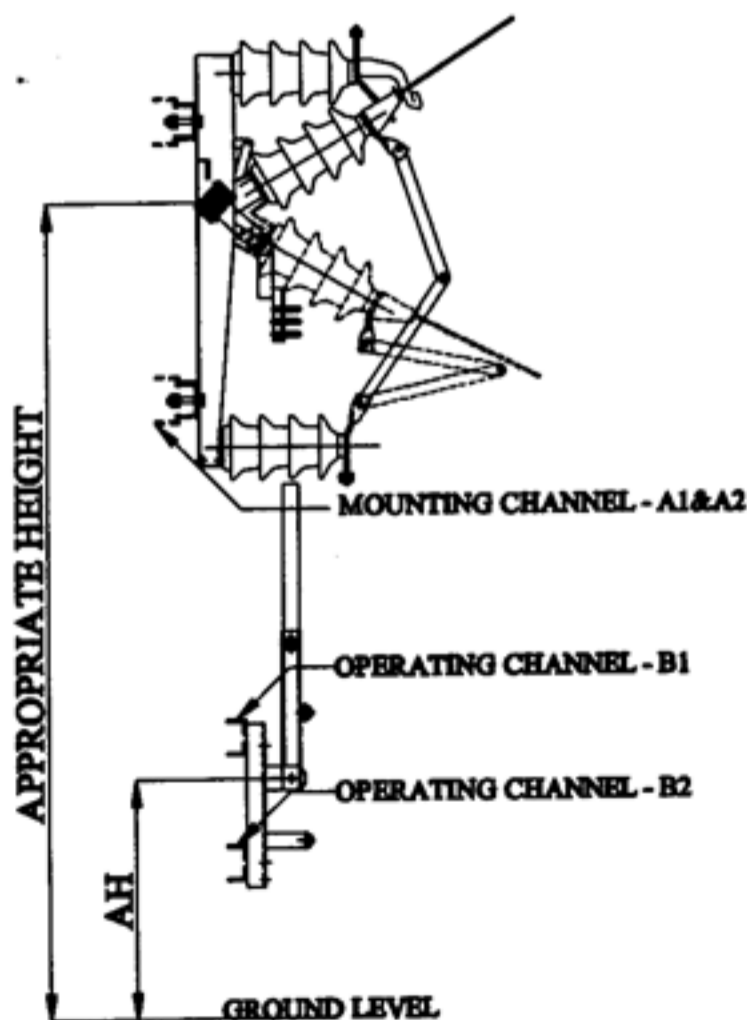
# DETAILED INSTRUCTION FOR MOUNTING / INSTALLATION OF THE AIR BREAK SWITCH - HORIZONTAL/VERTICAL TYPE
